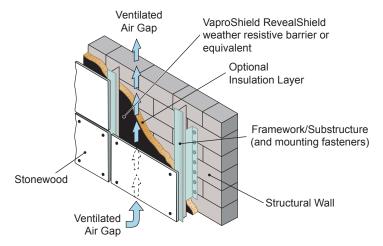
Stonewood used as rain screen cladding in ventilated facade system
